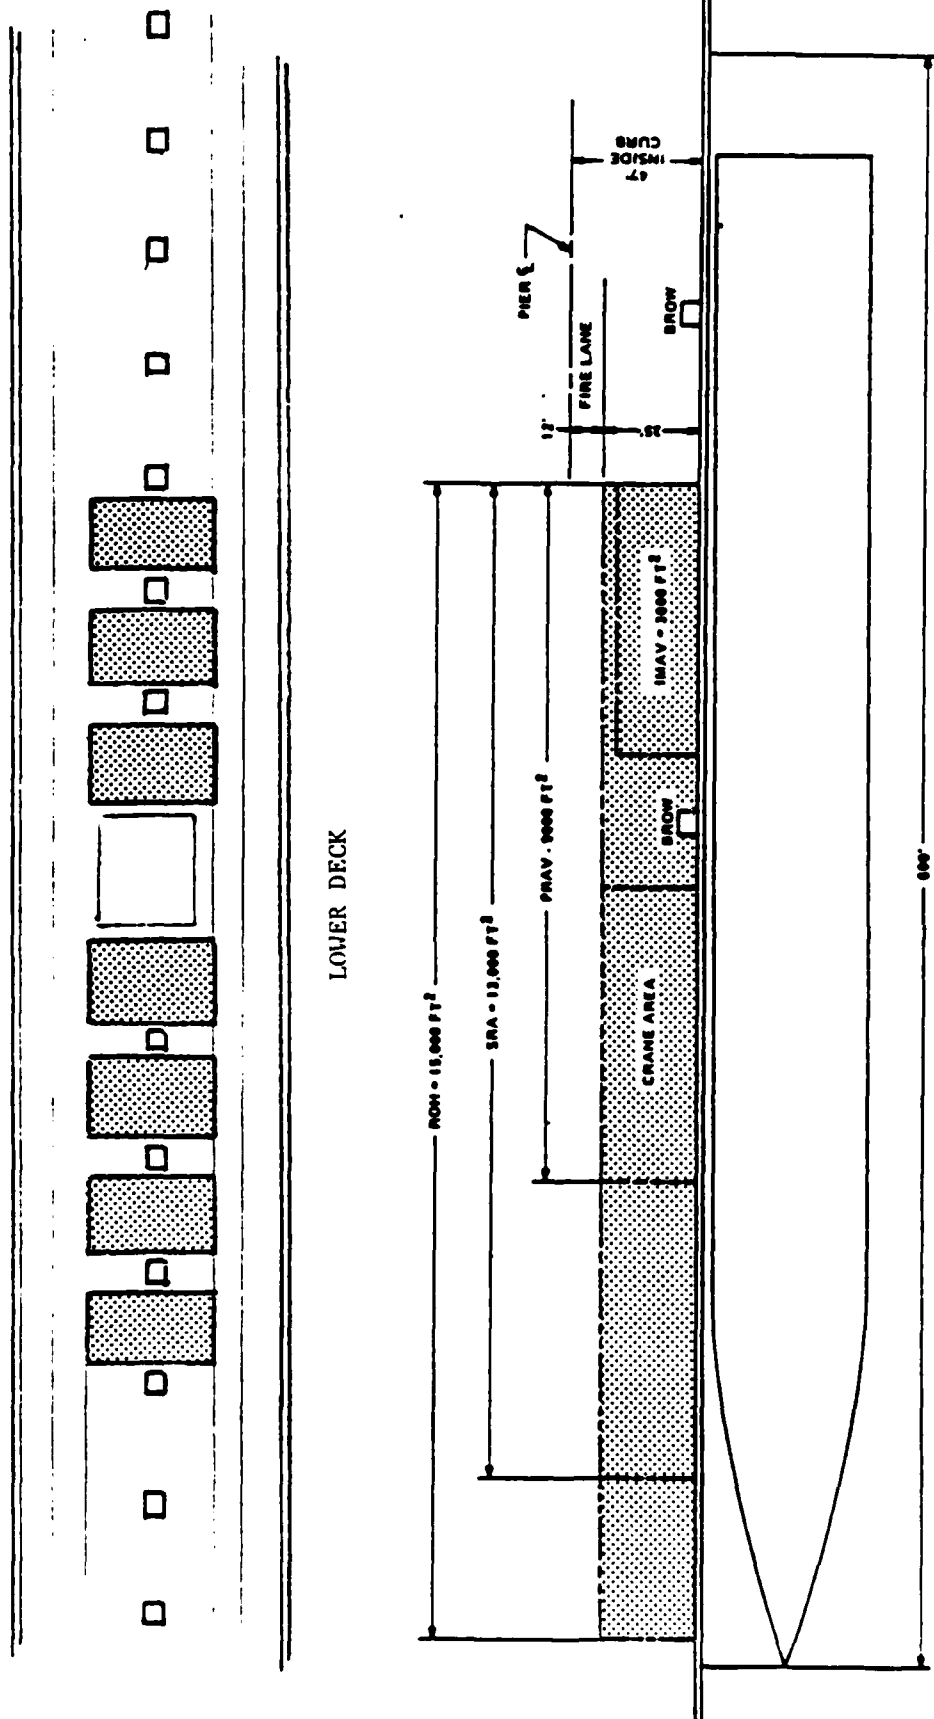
Space Requirements for ROH - Double-Deck Pier.
